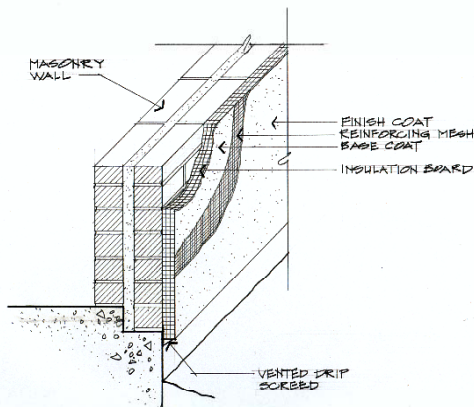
Mass Storage Wall Design EIFS with Masonry Substrate
